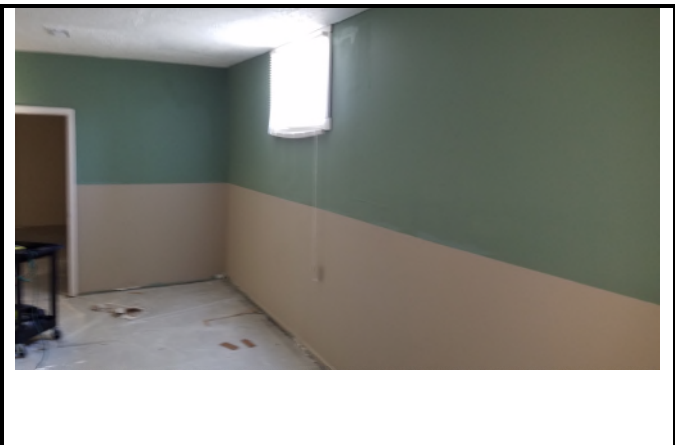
HA2 9x9 Floor Tiles w/Mastic
